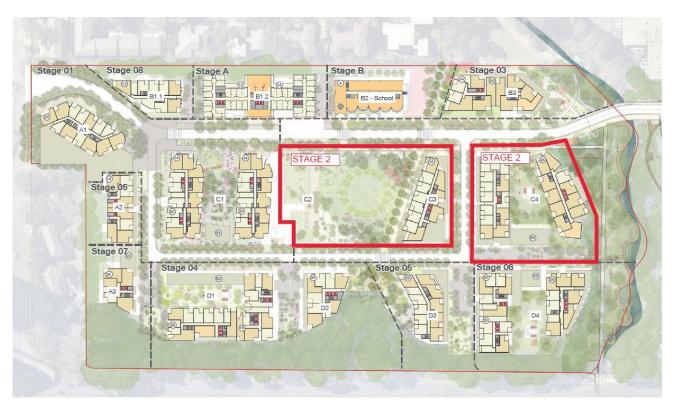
Ivanhoe Concept Masterplan staging plan, with the Stage 2 area highlighted
